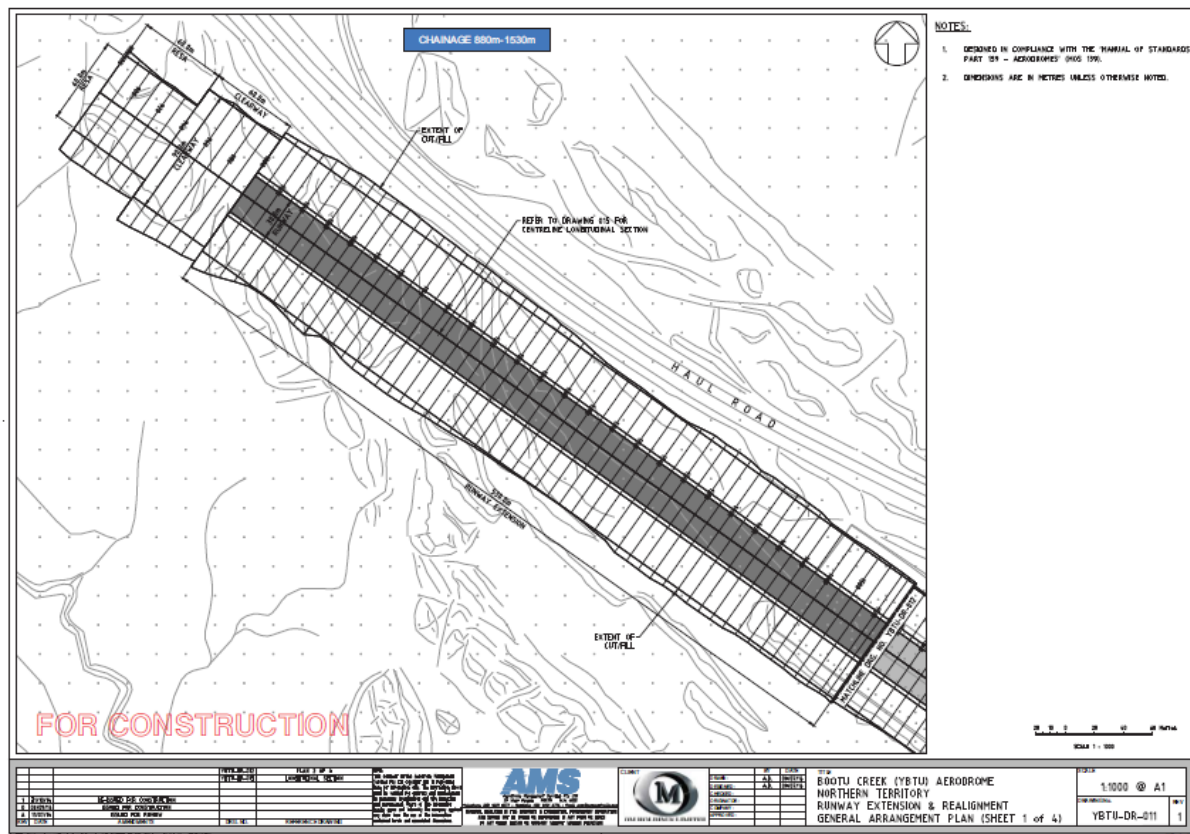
Plan of the aerodrome constructed at the BCMM. The drawing depicts the constructed runway.
